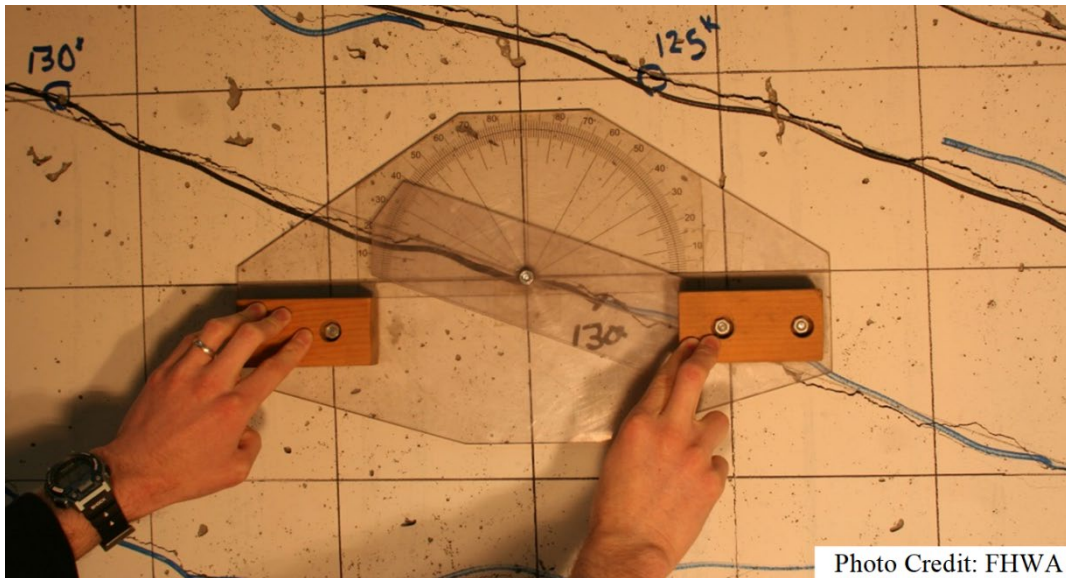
Photo. Crack Angle Measurement using a Crack Protractor. The photograph shows diagonal cracks in the web of a prestressed concrete girder. A clear plastic crack protractor is held in place on top of one of the cracks demonstrating how the angle was measured.
